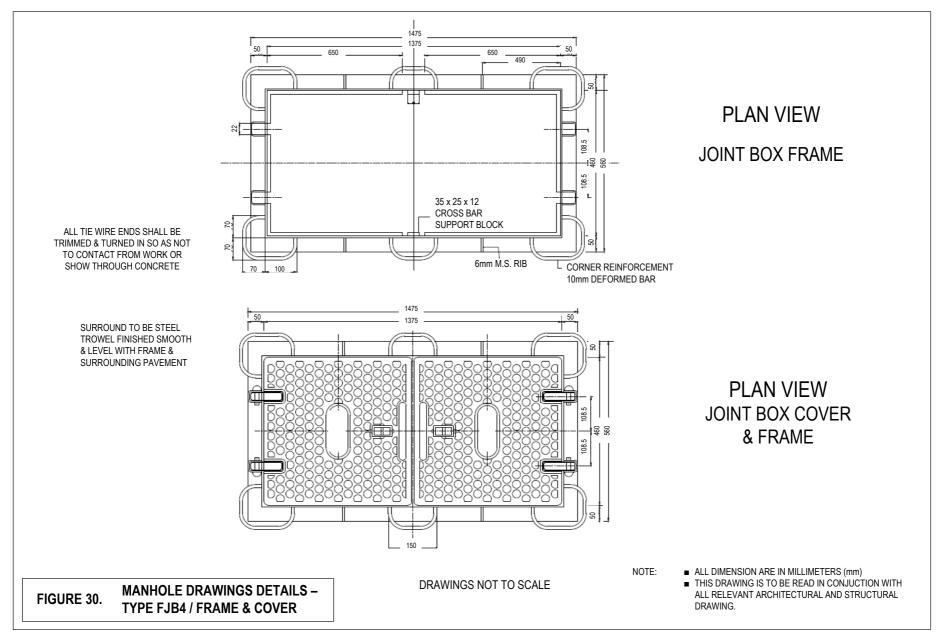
Manhole drawings details – Type FJB4 / Frame and cover
